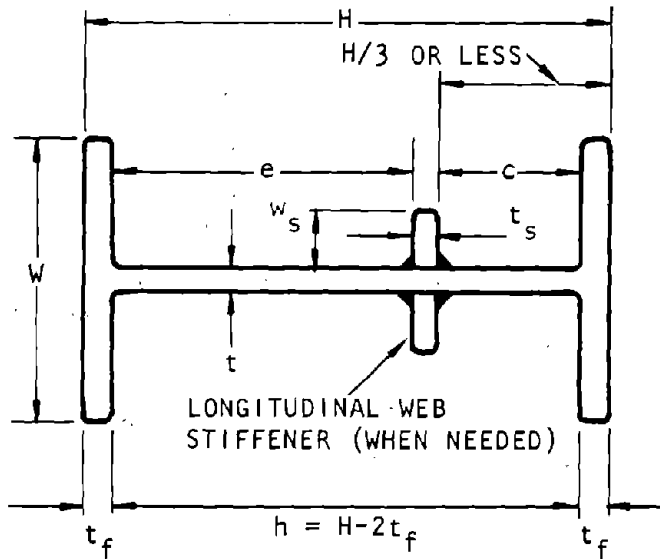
Typical Beam Section Reinforced to Prevent Web Buckling (COE, 1965)
